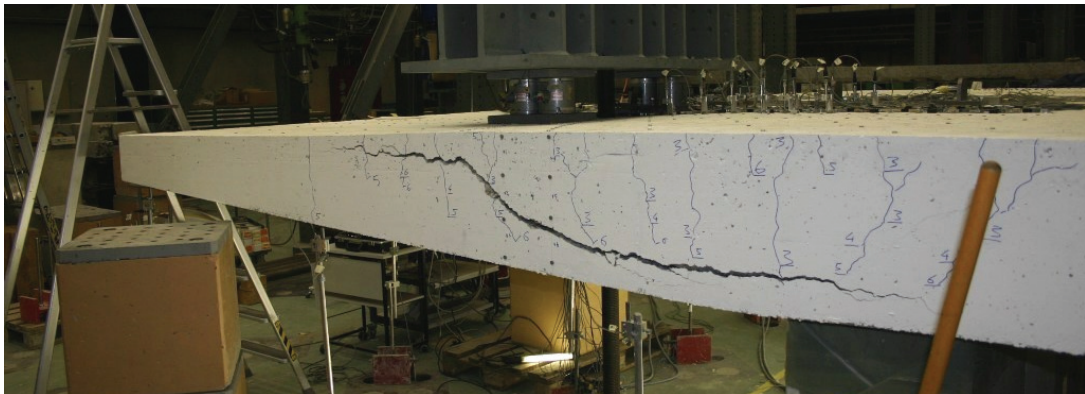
Test DR2-b: Side view of the shear crack after failure
